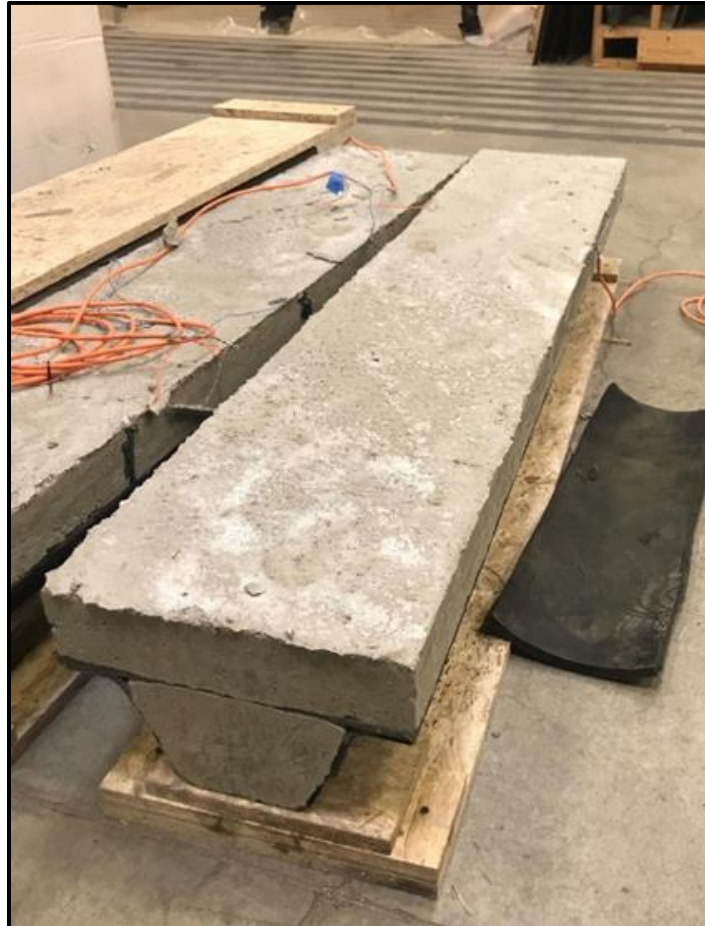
Completed Hybrid Closed-Corrugation Specimen
